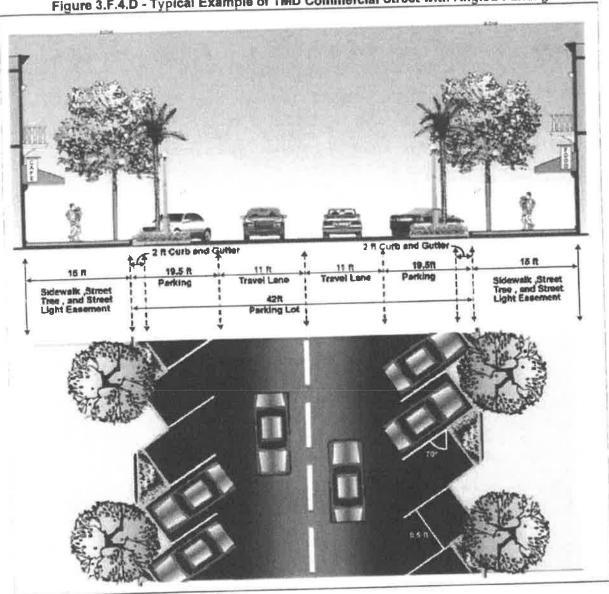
F.4.D - Typical Example of TMD Commercial Street with Angled Parking
